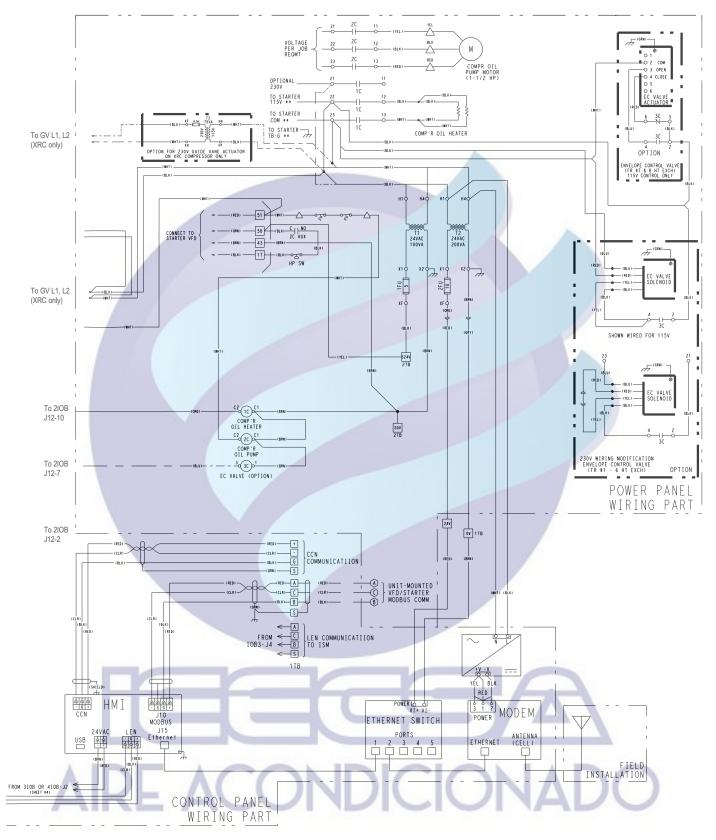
19XR2-E Chiller Control Schematic for Unit Mount VFD Chiller
